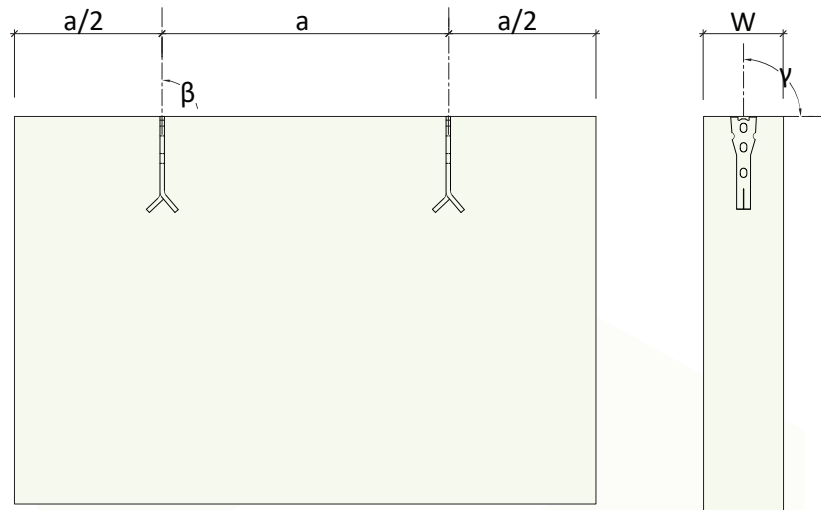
Minimum element thickness and minimum lifting insert spacing in wall elements
